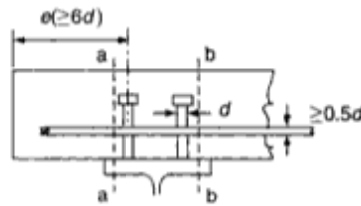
Longitudinal shear reinforcement in an L-beam
